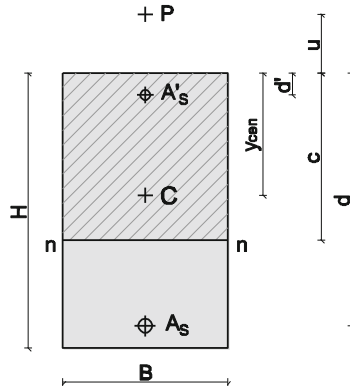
Geometrical properties of the RC element (rectangular cross-section)
